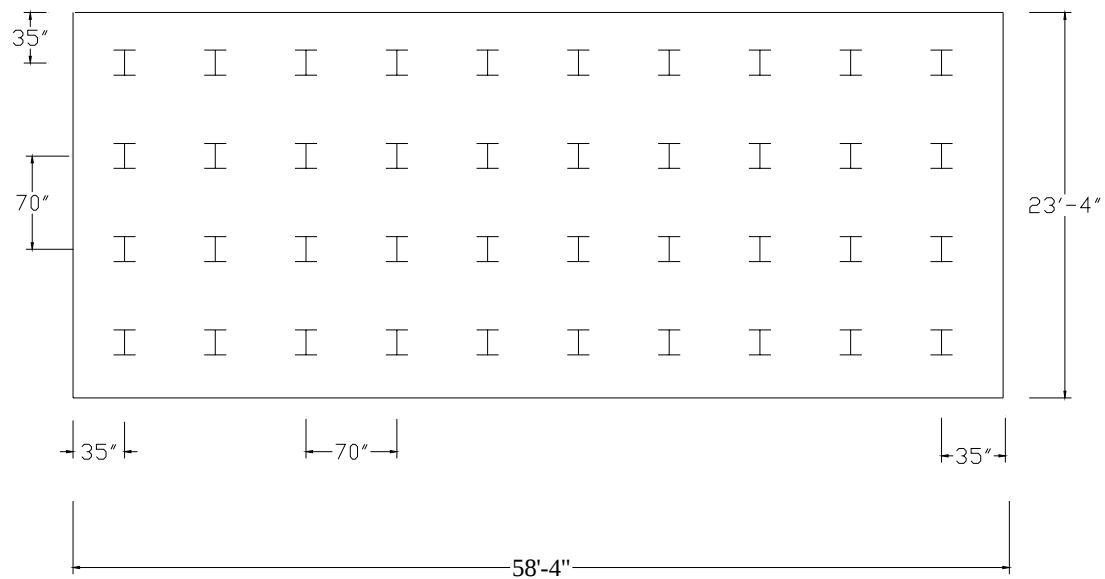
NCHRP Wall Design Details (Bents 1 & 3)
